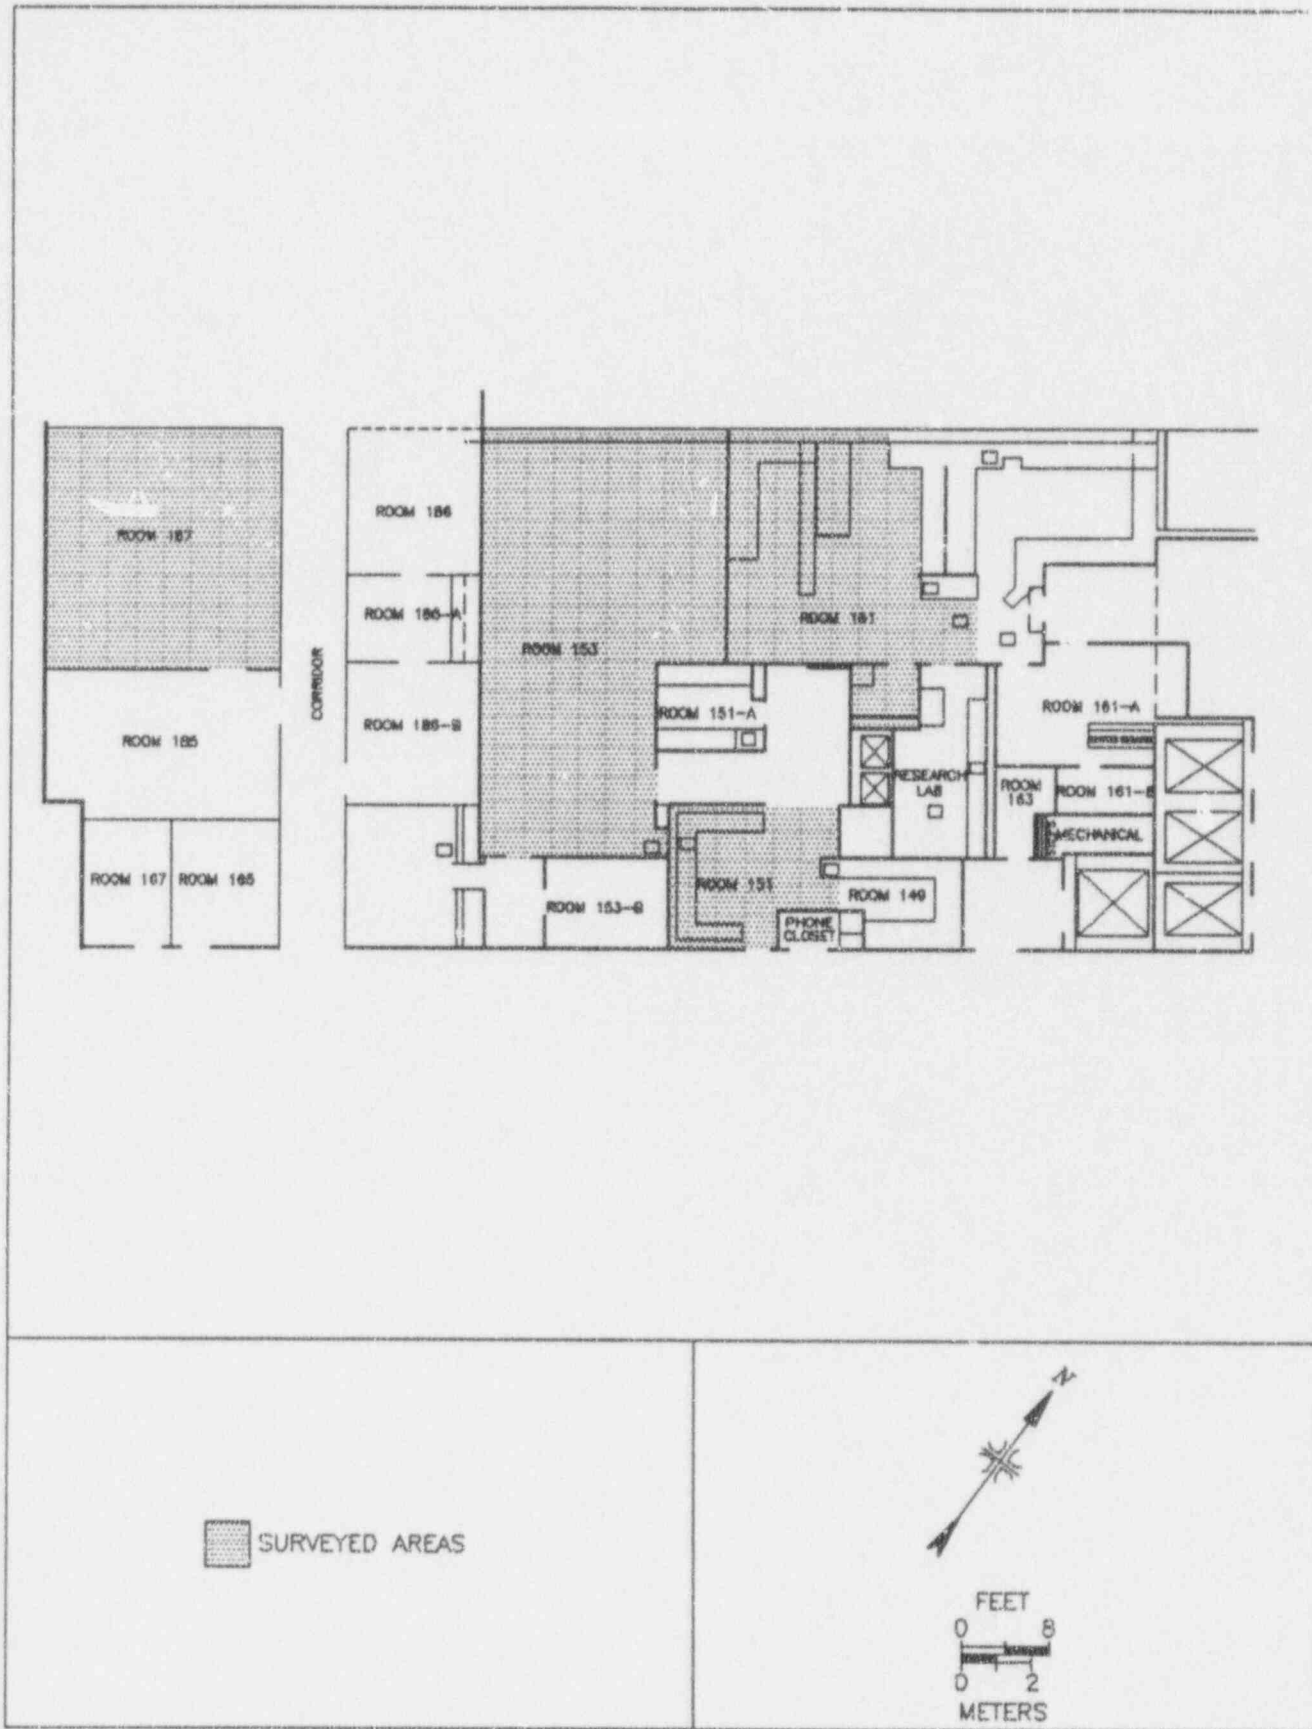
Portion of First Floor Plan – West Half of Building 1 of the Seattle VA Medical Center, Seattle, Washington
